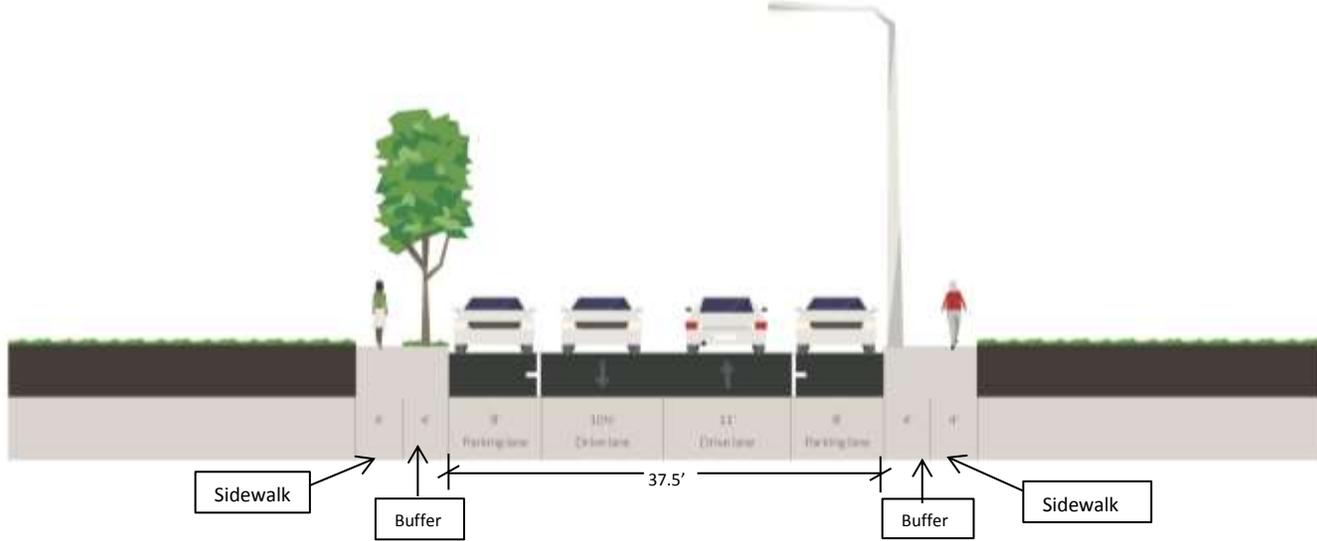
Burhans Boulevard between W Franklin Street at W Washington Street
